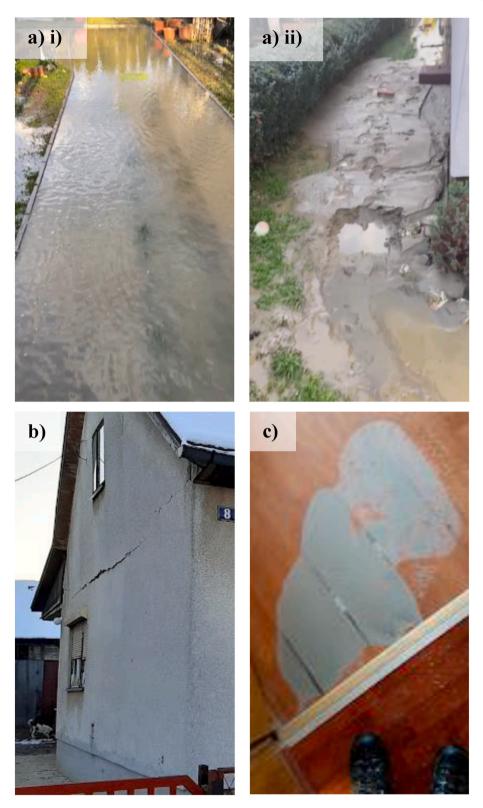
Liquefaction effects at Milan Makanac St: (a) (i) liquefaction-induced flooding and (ii) sediment ejecta at 11 Milan Makanac St [45.4361N, 16.2629E], (b) structural damage, as evidenced by horizontal crack between the first story and the attic, at 8 Milan Makanac St [45.4359N, 16.2627E], and (c) ejecta inside the house at 10 Milan Makanac St [45.4358N, 16.2628E].
